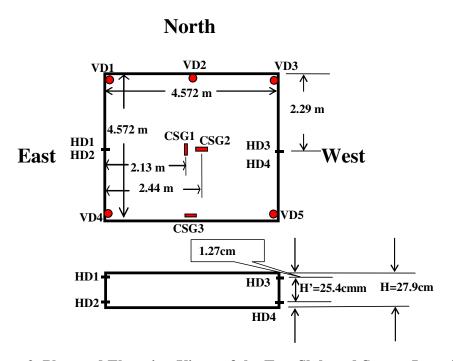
Plan and Elevation Views of the Test Slab and Sensor Locations
